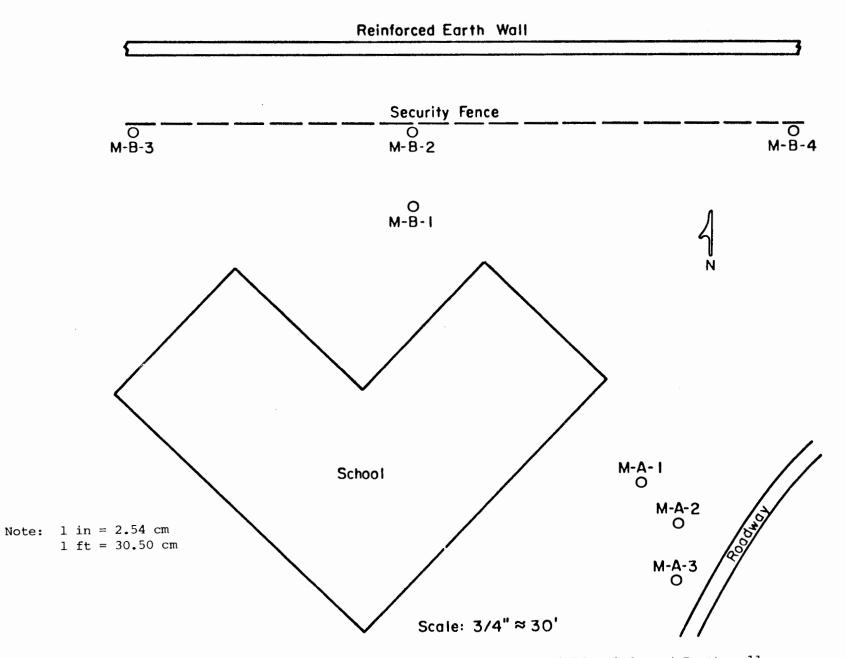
Structure 1: Sketch of area south of MARTA Reinforced Earth wall.
